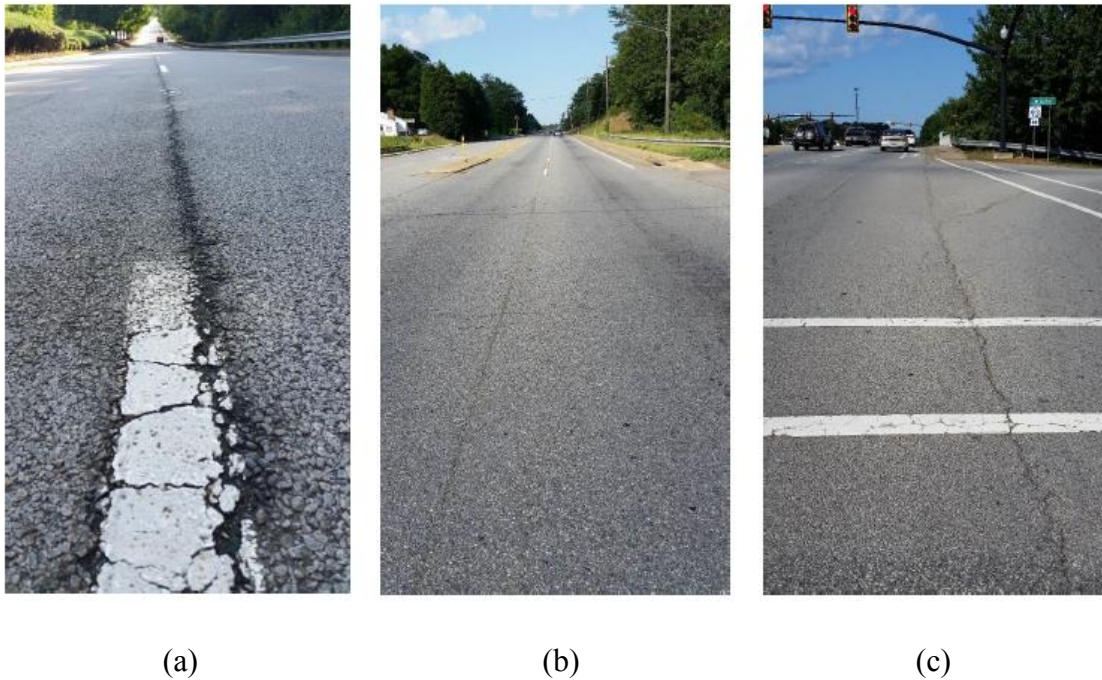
SC 93 Longitudinal joint cracking (a), (b) and (c) Pickens County, SC
